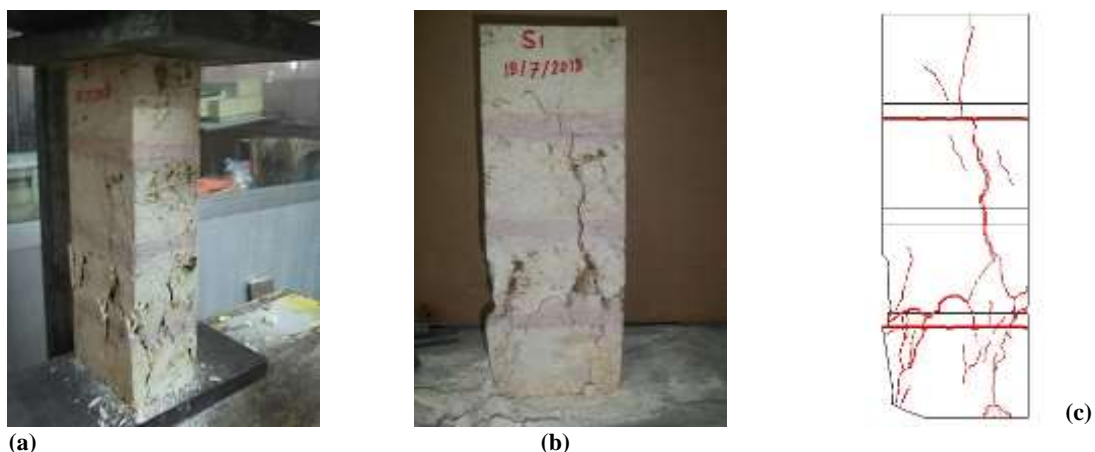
Shows the typical failure mode of the unstrengthened masonry prisms, (a): during failure, (b): failure mode, (c): a sketch for failure patterns (vertical cracking and bond failure).
